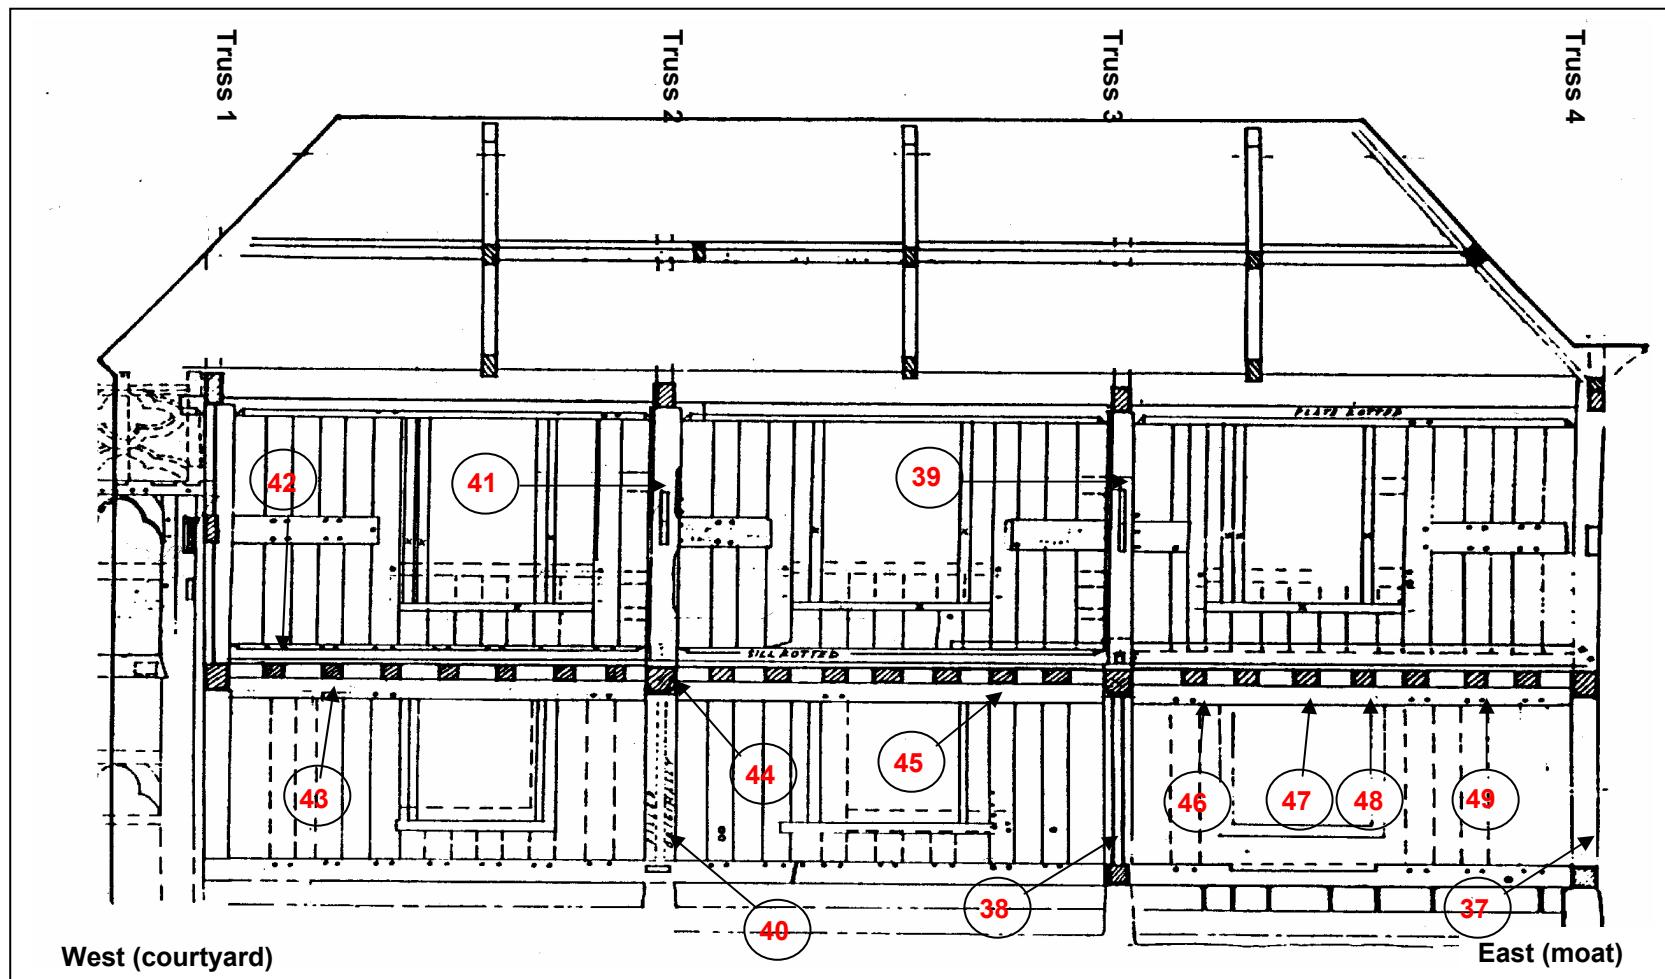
Main House or west range roof plan to show sampled oak timbers
